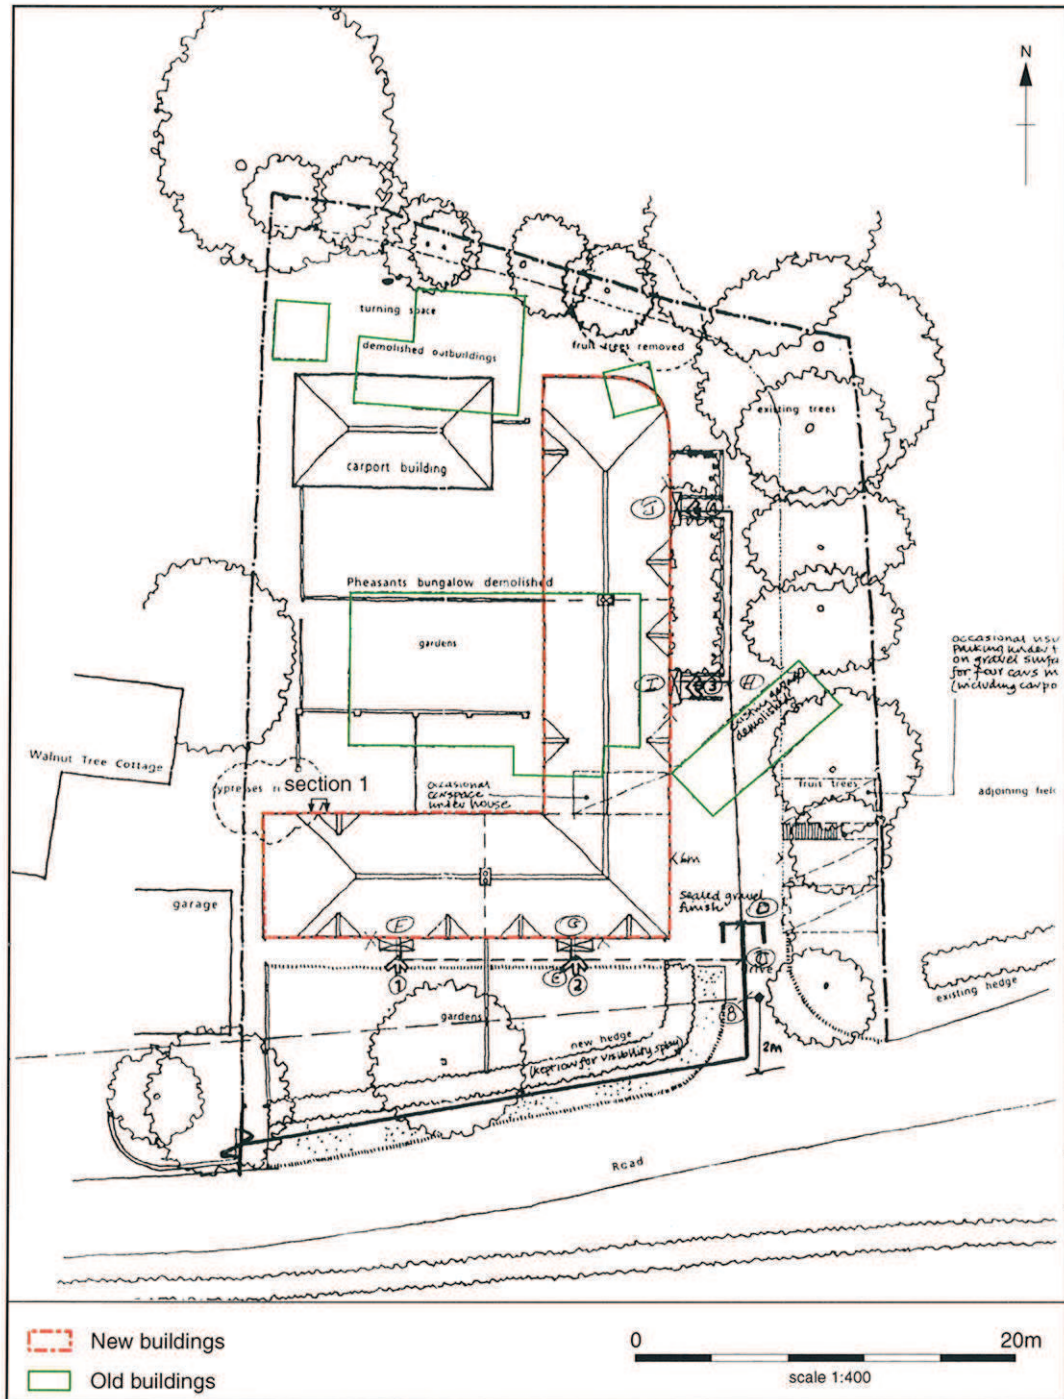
Site Plan Showing New and Old Buildings and Section 1
